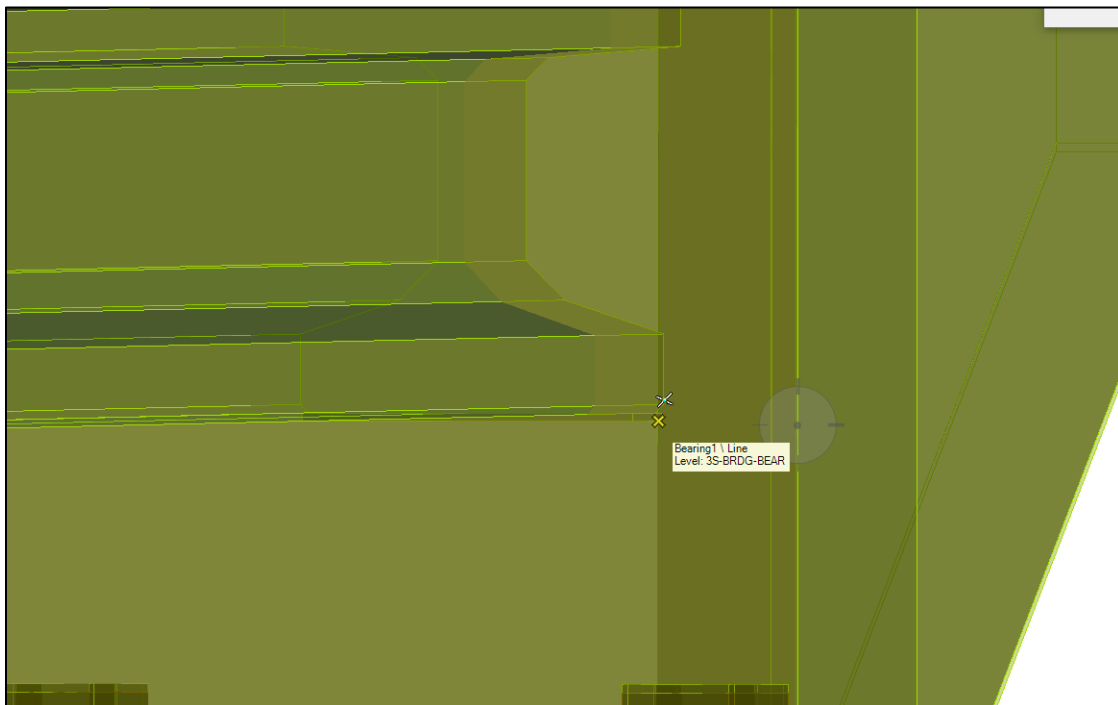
Adding the Construction Joint Linework Between the Beam Cap and Diaphragm
